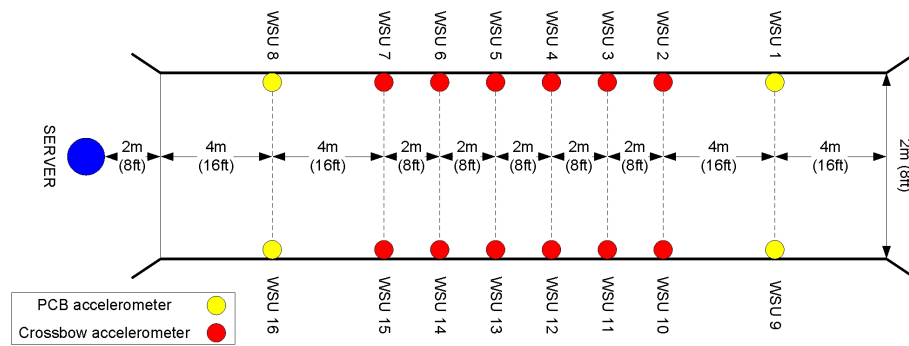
Narada* sensor layout for Bandemer Park pedestrian bridge field test.
